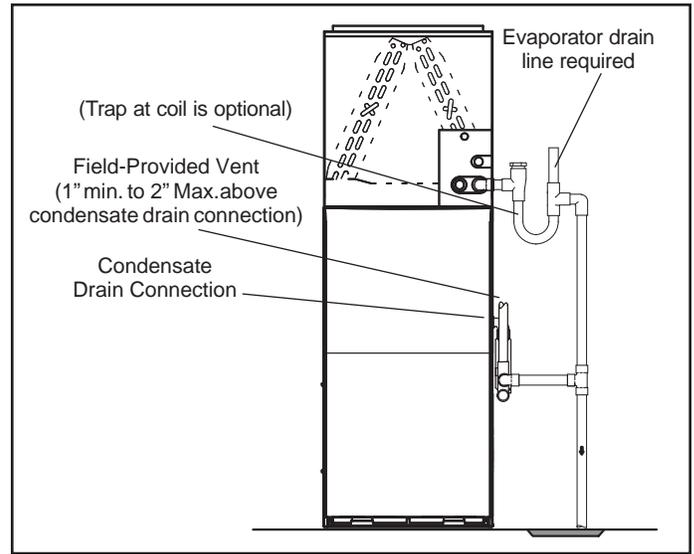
Furnace with Evaporator Coil Using a Separate Drain
